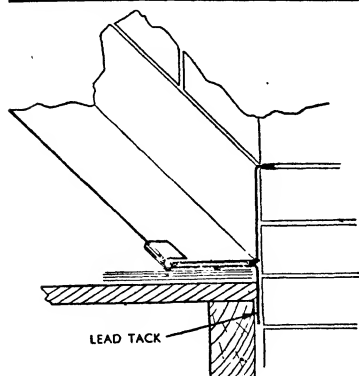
Flashing with its top edge turned into the brickwork. A lead tack securing the flashing is shown.
